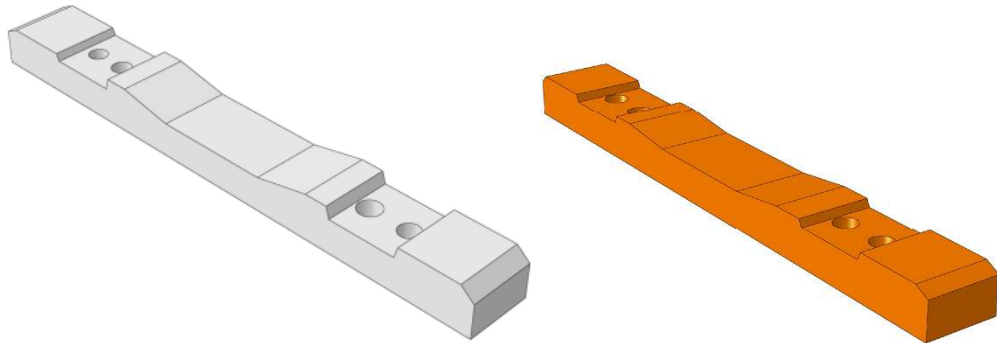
Geometry of the existing Prestressed concrete sleeper (not to scale)
